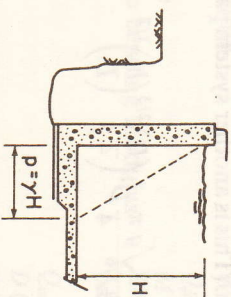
Hydrostatic loading of an unpropped cantilever
